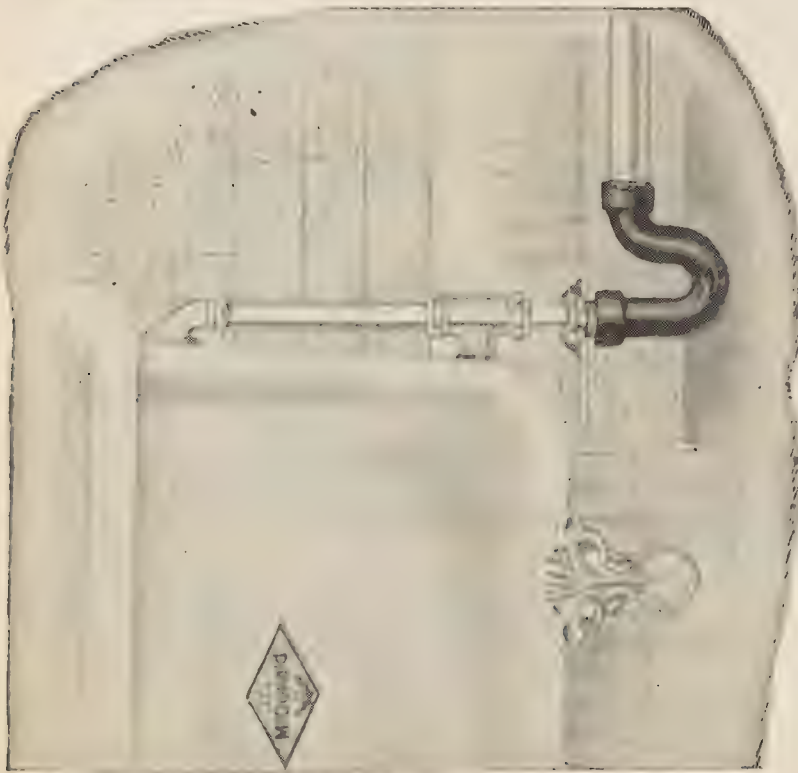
Diamond half S or P, cast iron trap and overflow connections. The trap is threaded female at inlet and outlet. Since the inlet is practically level with the top of outlet the trap is below the floor. A brass soldering bushing is soldered on lower end of waste tube and the latter screwed into inlet of trap.
